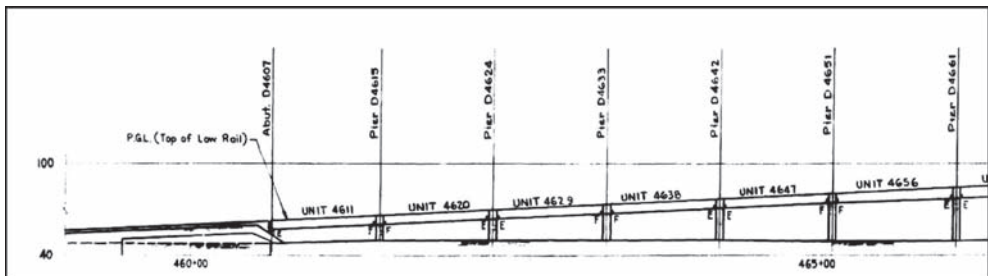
Typical divisions of a structure for inspection. Diagram shows the labeling of each of the primary parts of the bridge: Abutment, spans/units, and piers. For each item an inspection report is created with forms specific to it.
